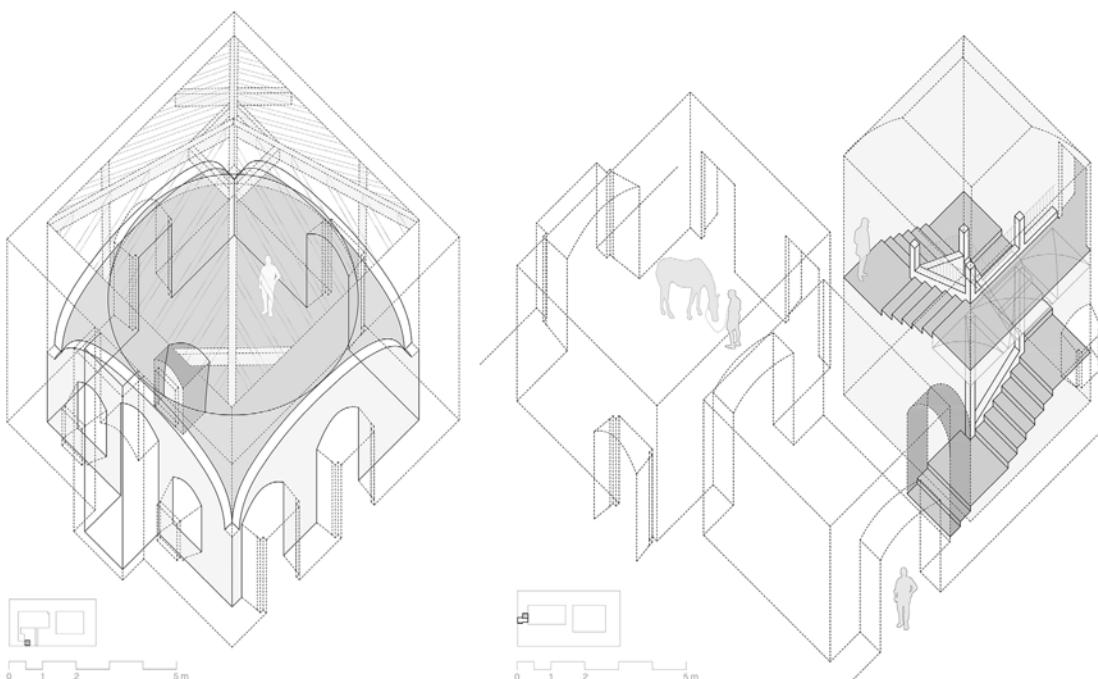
Reconstruction of the ground floor of the Santillana shearing building. Author.
